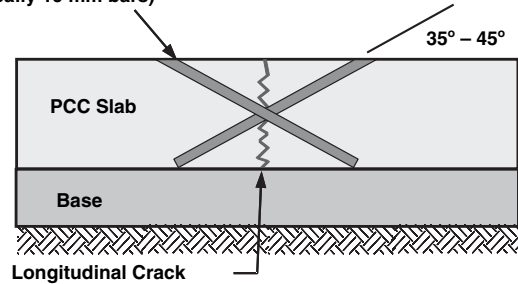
Cross-stitching of longitudinal crack (Hoerner et al. 2001).
